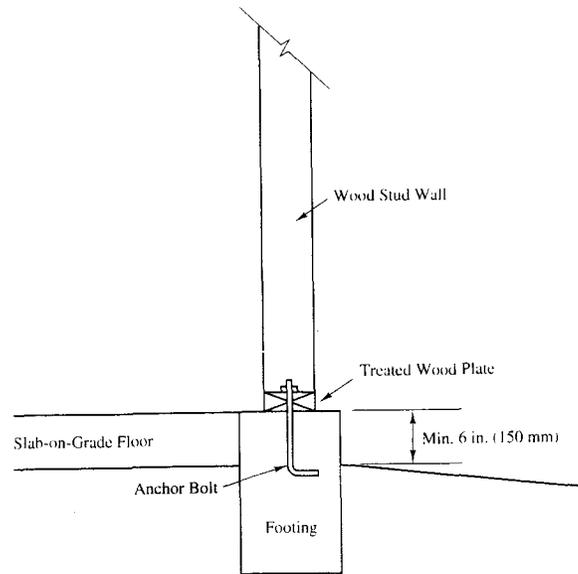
Use of anchor bolts to connect a wood-frame wall to a continuous footing.
